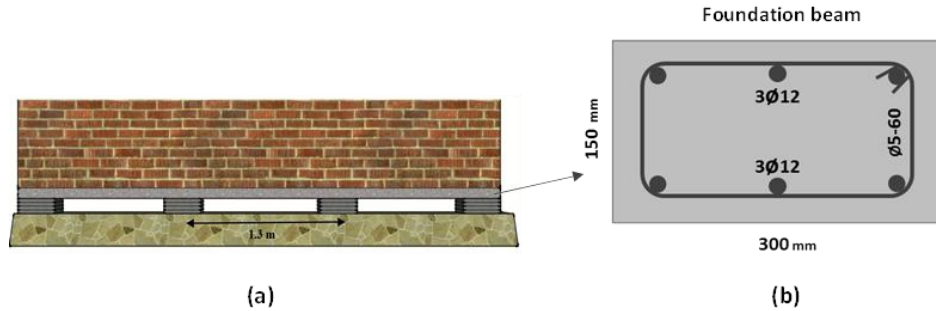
(a) A sketch of masonry structure isolated with unbonded elastomeric isolators, (b) detail of the foundation RC beam.
